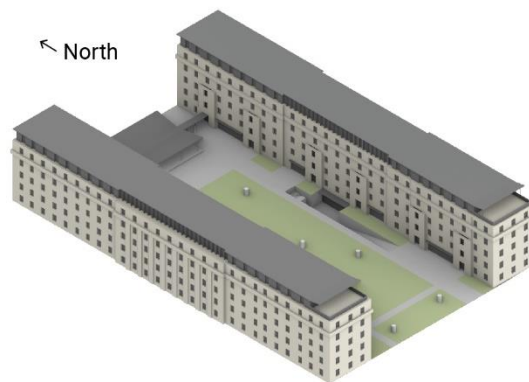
Renovated building showing roof extension, cuts into first floor, the ramp, and the pavilion
